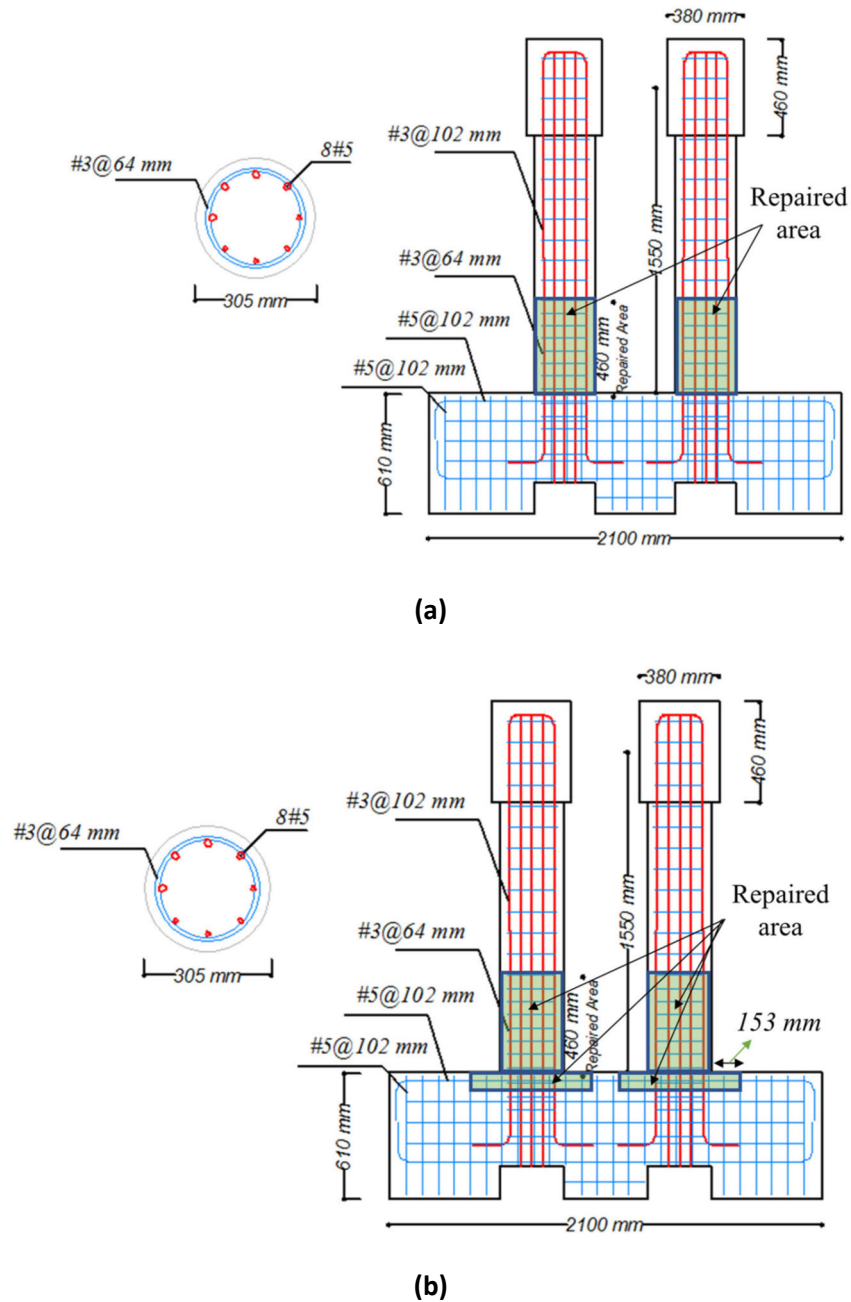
Dimensions of Test Specimen: (a) Footing not Repaired, (b) With Footing Repair (Farzad et al. 2019)
